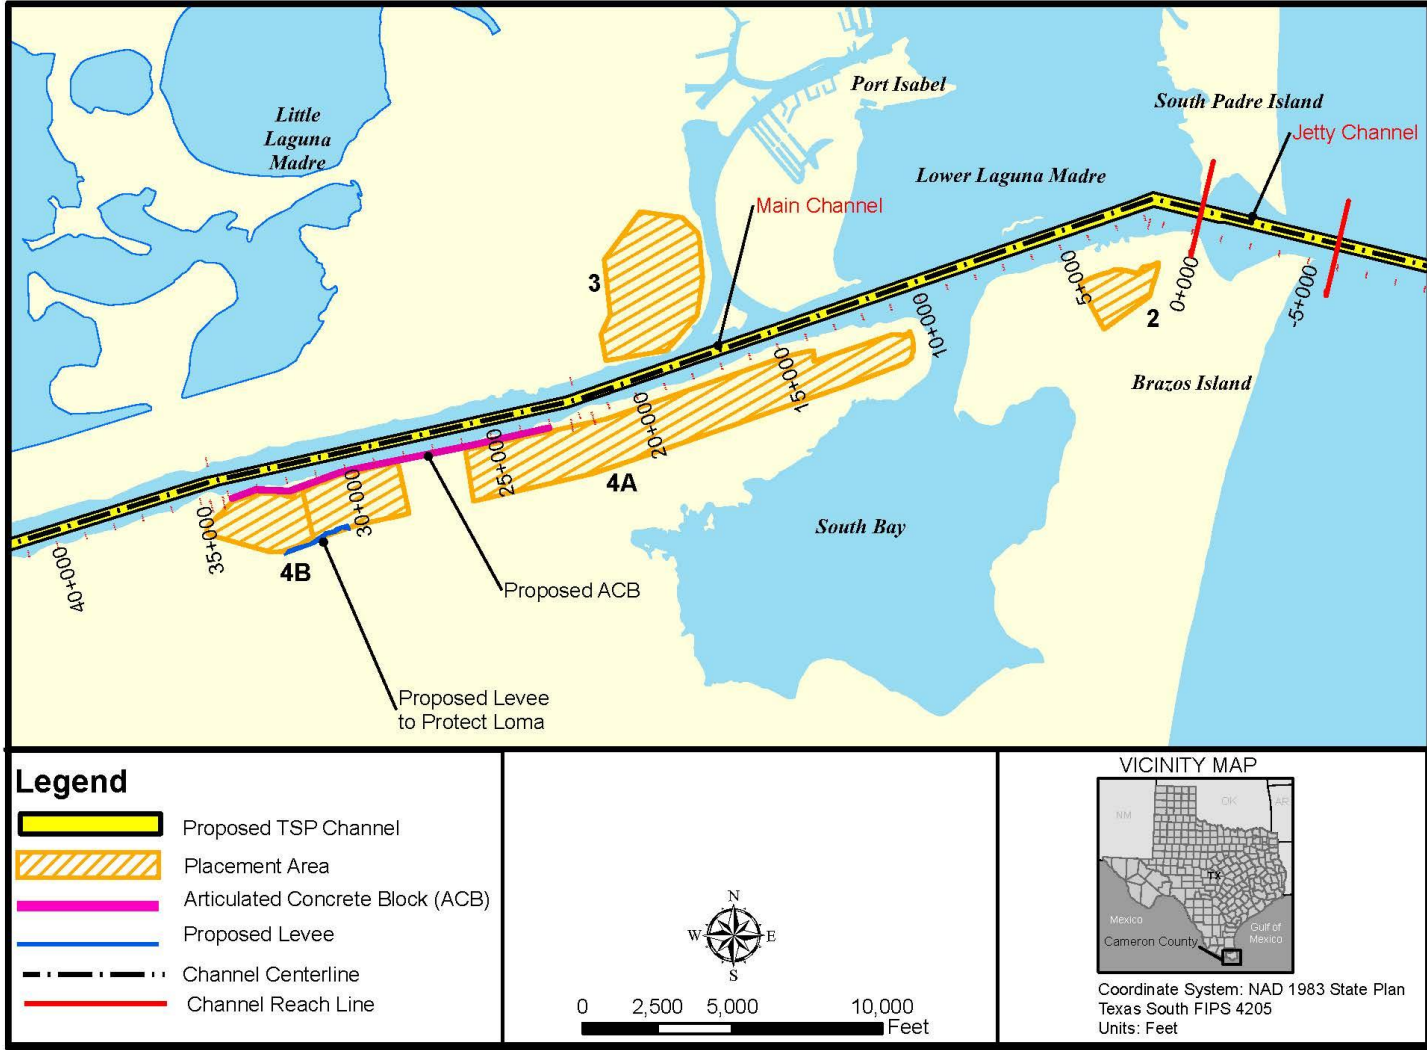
Recommended Plan - Jetty Channel to Main Channel
